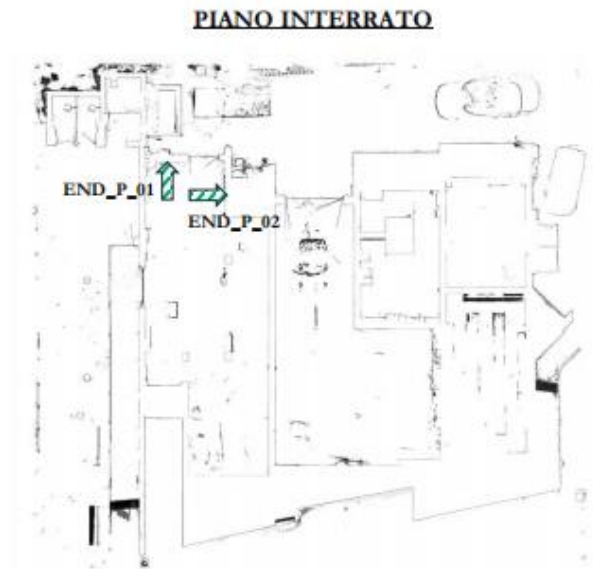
Location of investigated walls in the underground floor (END\_P\_01, END\_P\_02)
